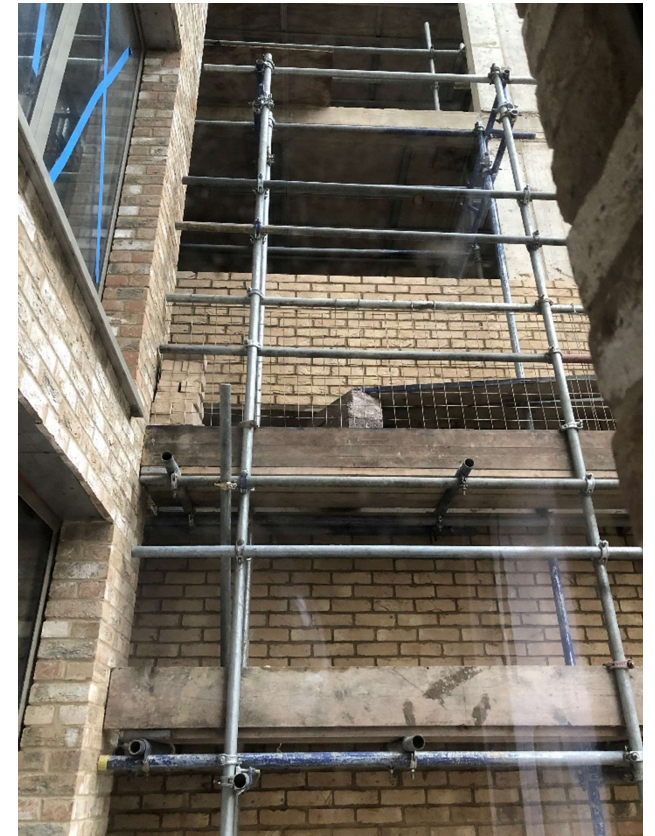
Flat 312 balcony view, brick flank wall under construction
